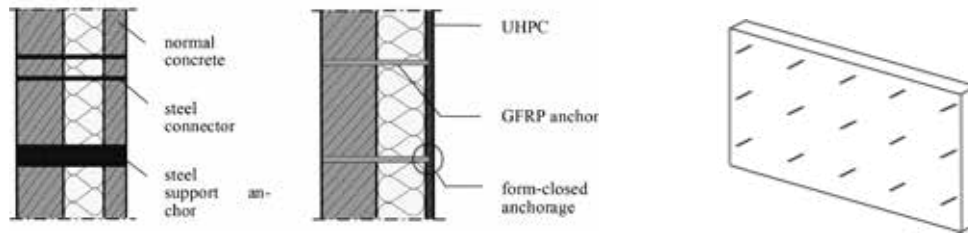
left: normal sandwich wall; middle: UHPC sandwich wall; right: anchoring concept for UHPC sandwich wall
